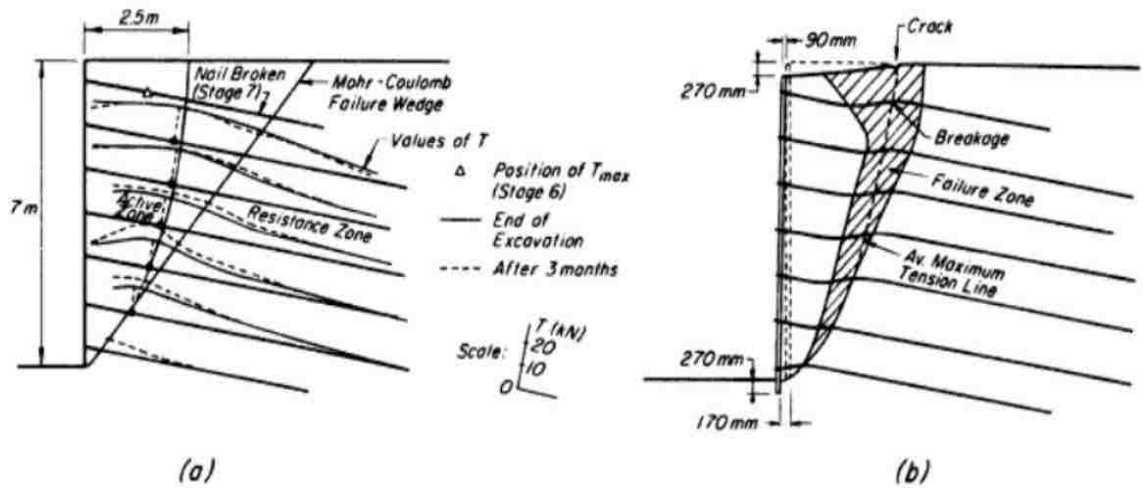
(a) Distribution of tensile forces in nails behind experimental wall (b) Distortion of nails behind wall and displaced position of wall at failure
